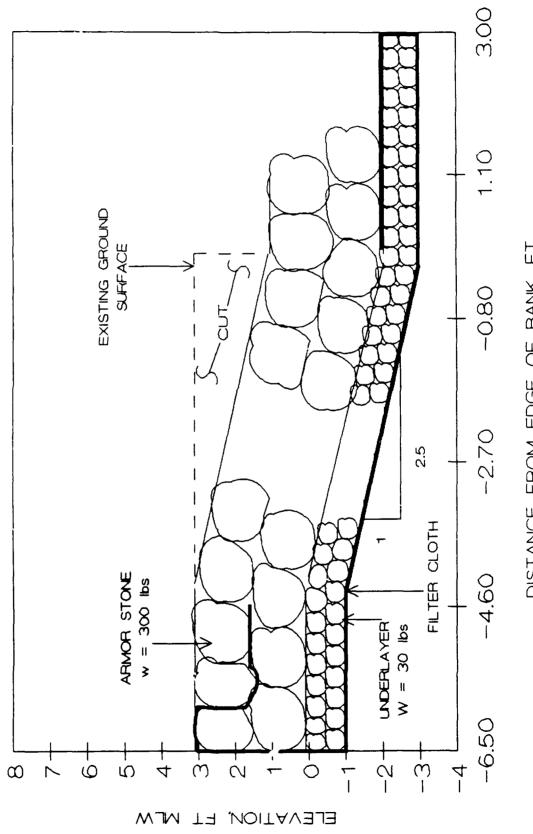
PLACED RIPRAP REVETMENT PROPOSED FOR SITE 6
